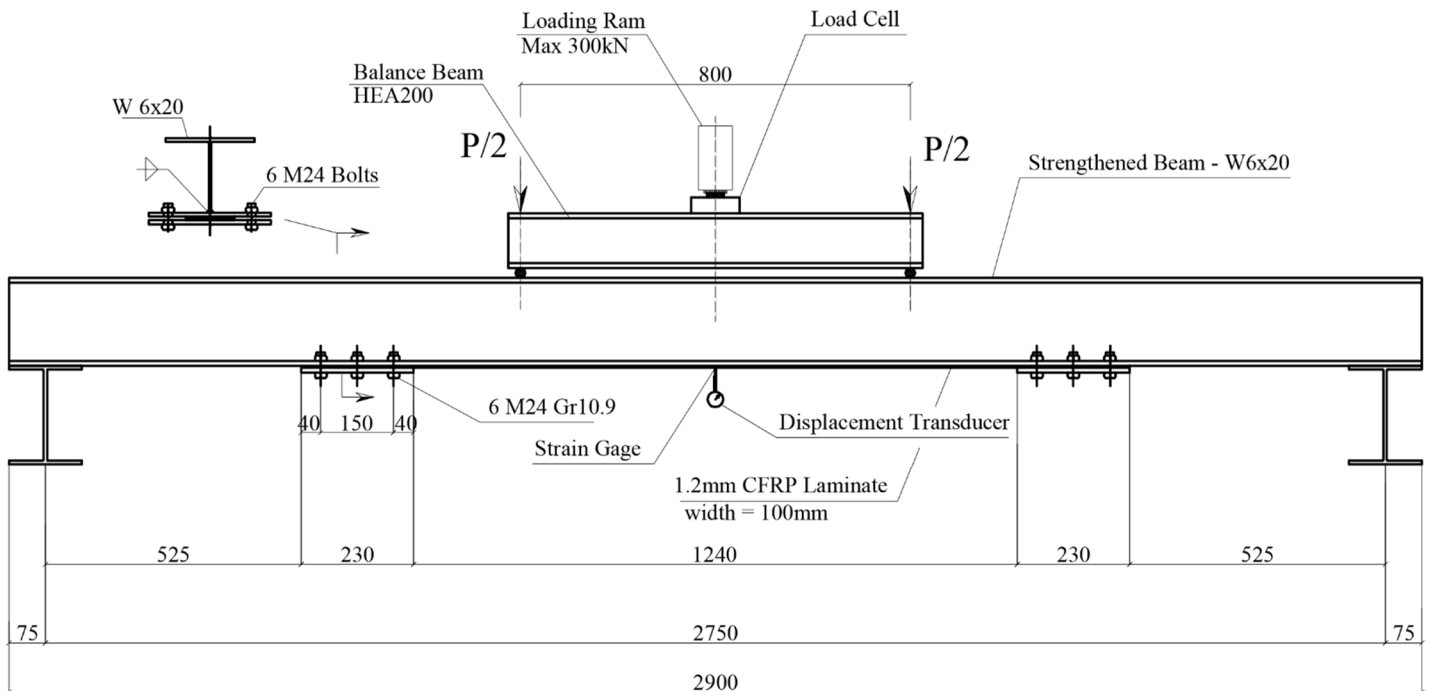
Test setup for a typical strengthened steel beam with CFRP prestressed laminate [15].
